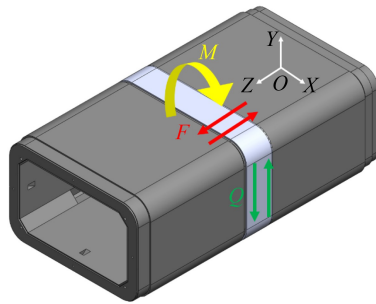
Rectangular pipe-jacking tunnel force diagram.
